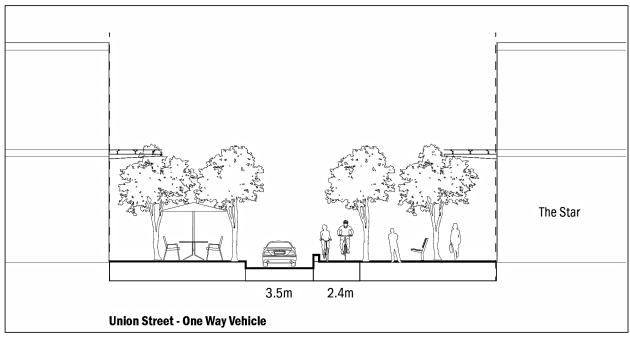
Street section 3: Union Street One Way Vehicle (Hassell)
